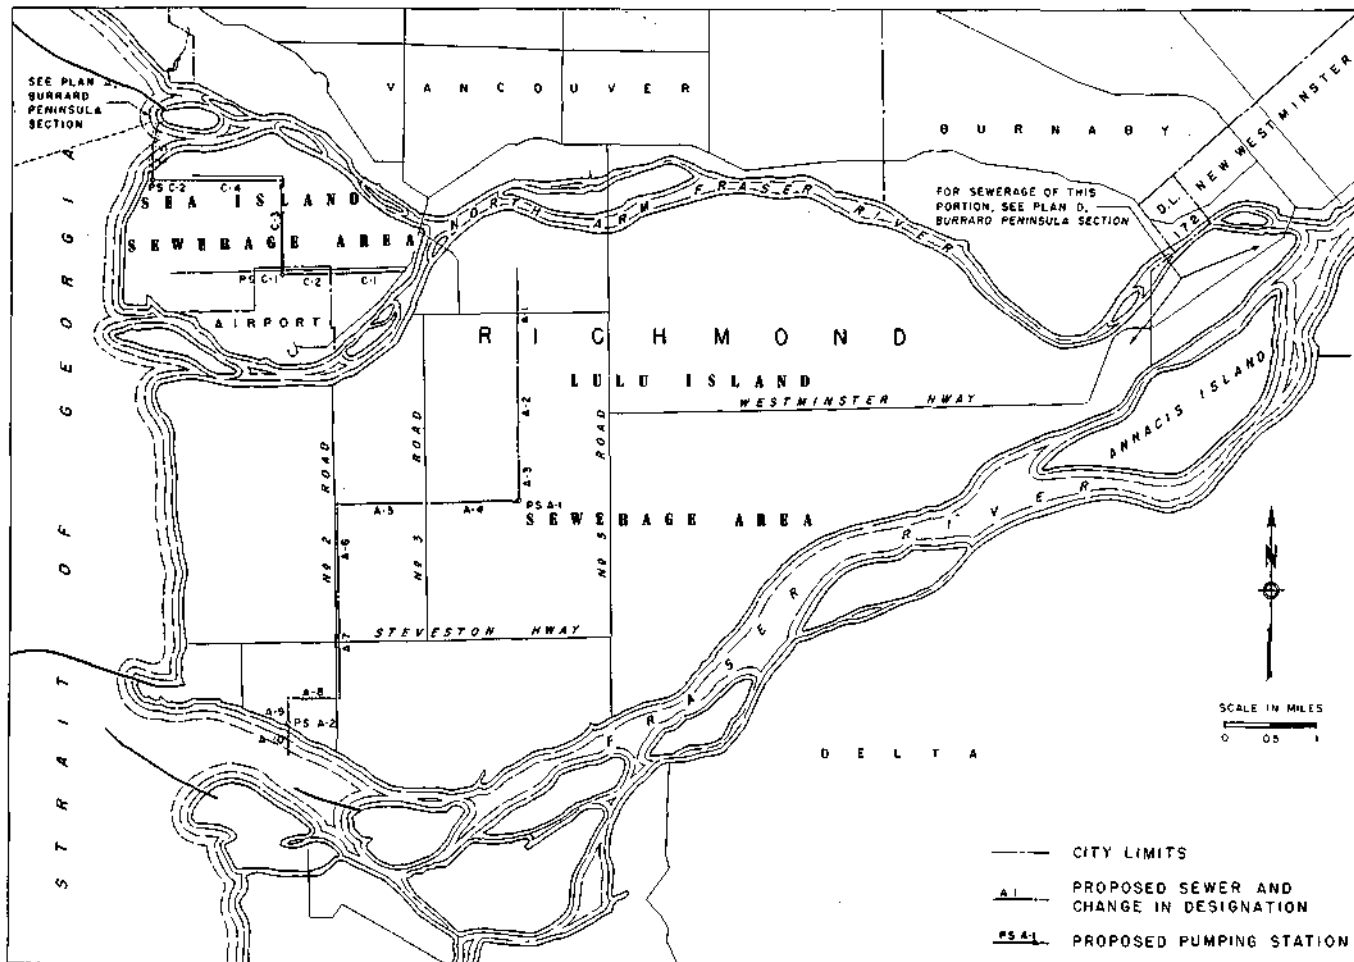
Proposed Layouts of Plan A and Plan C, Richmond Section
